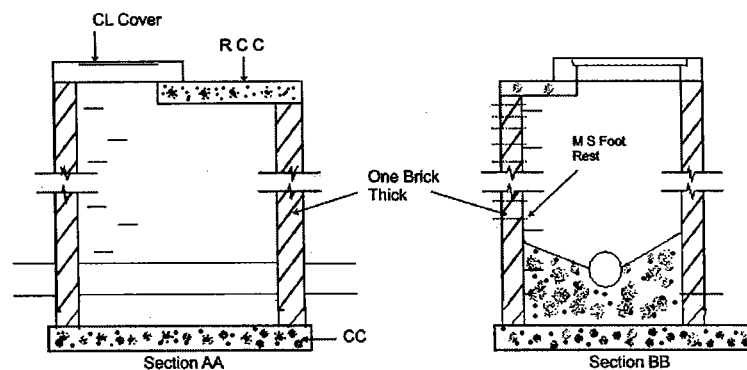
Rectangular manhole for depth 0.9 m to 2.5 m
